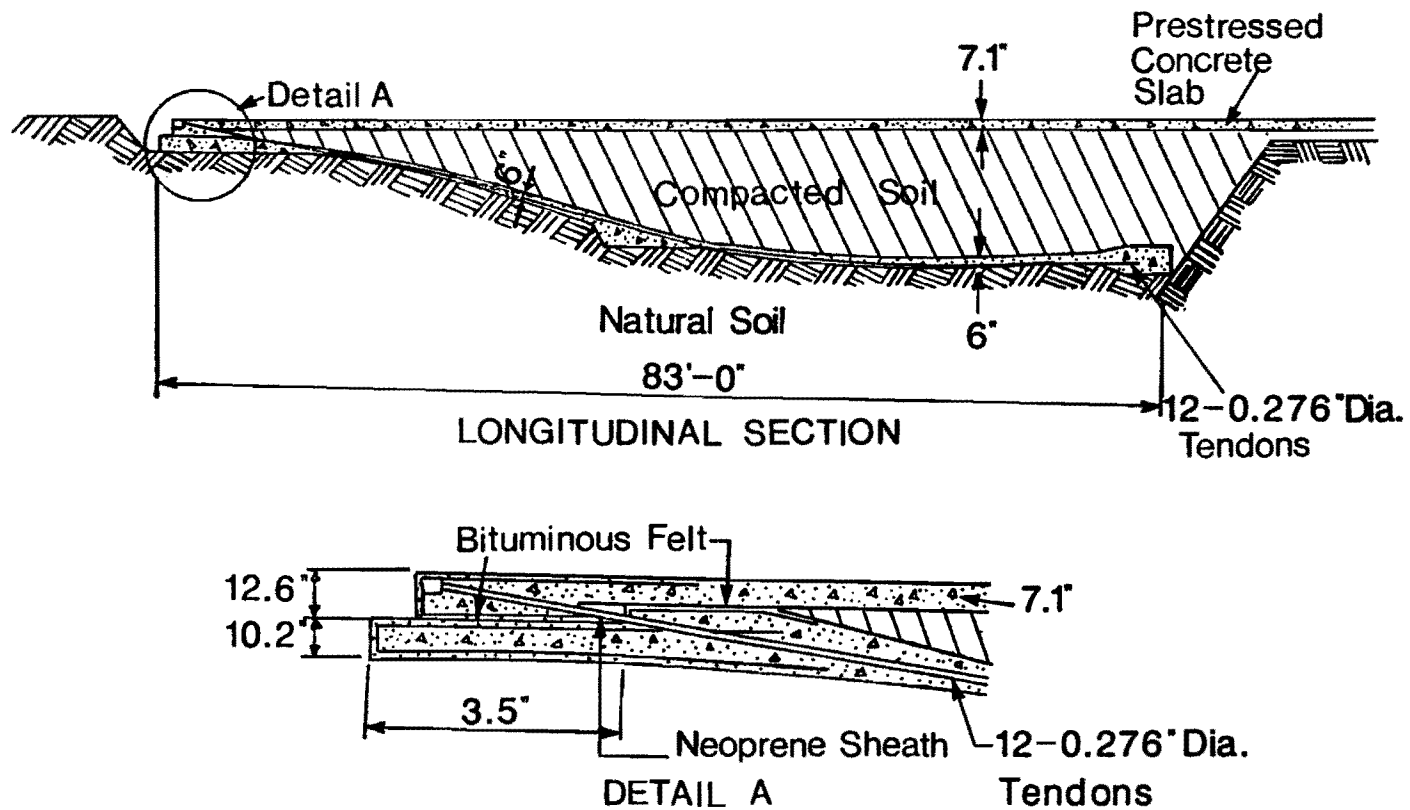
Abutment for Maison-Blanche Airport, Algeria (Refs 56, 131).
